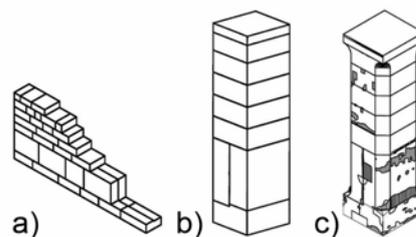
Scheme of the pillar assemblage: (a) original wall, (b) original shape of the pillars and (c) shape after 1924-26 intervention.
